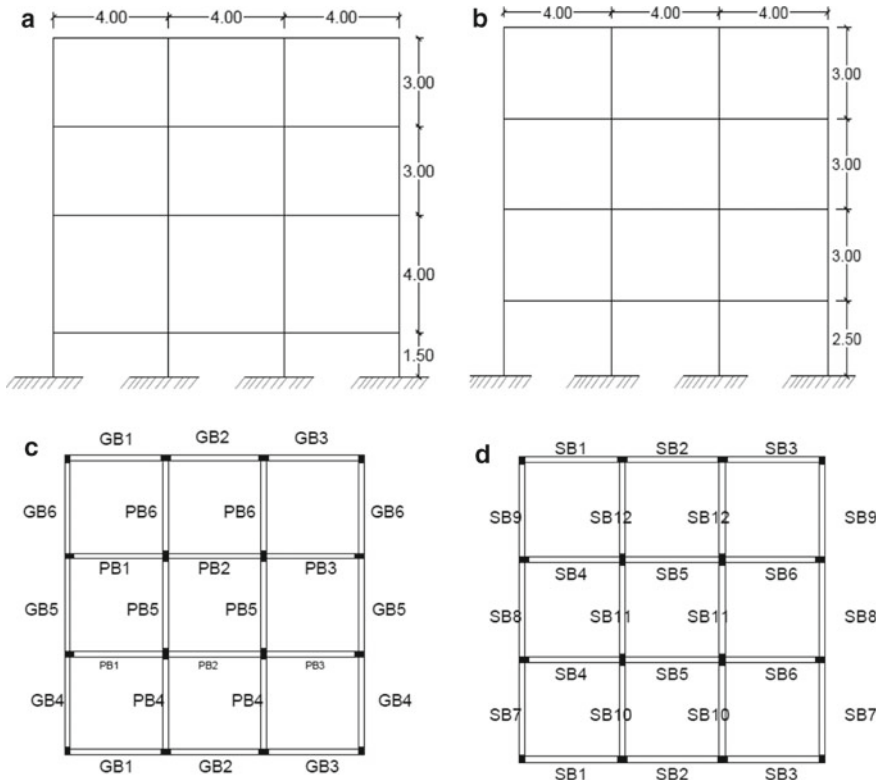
a Elevation of Frame 1 and Frame 3. b Elevation of Frame 2 and Frame 4. c Plan showing Ground beams and Plinth beams. d Plan showing Slab beam for first, second, and terrace floor
